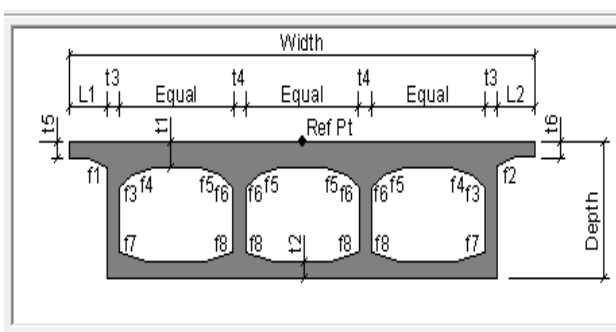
Finite Element model of Rectangular box girder bridge Superstructure created in SAP 2000
